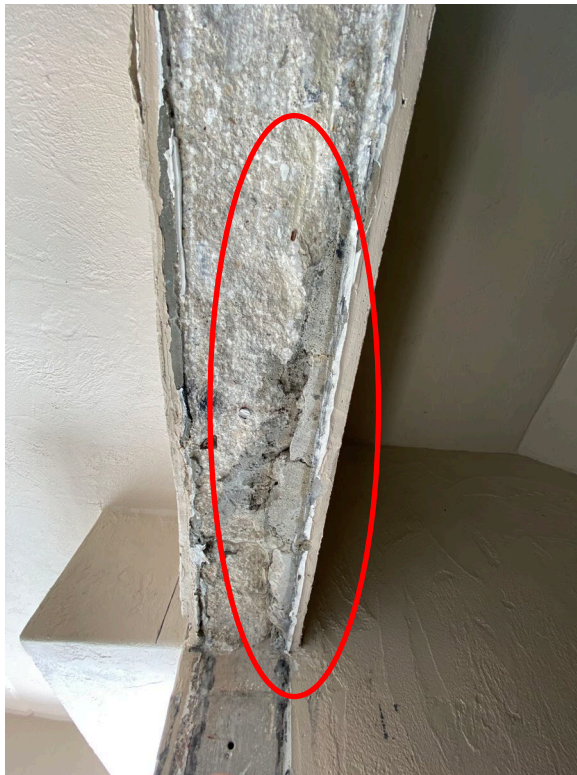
Cracked concrete at beam going above garage soffit
